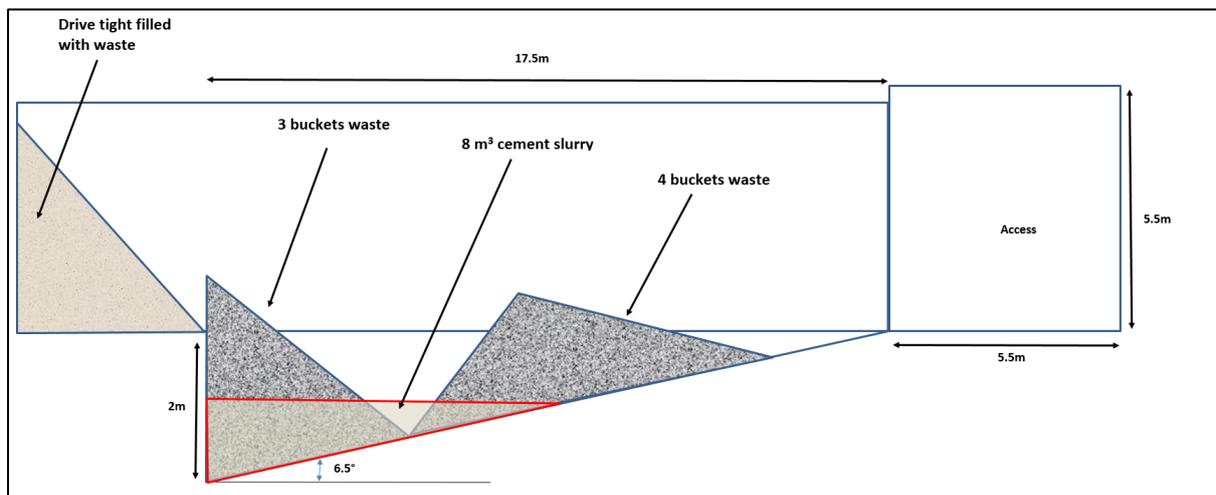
Long-section schematic of inactive drive mixing cuddy (not to scale)
